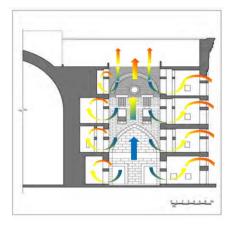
Stack effect, single sided and cross ventilation in the Hanafiyah madrasa courtyard (Source, author)
